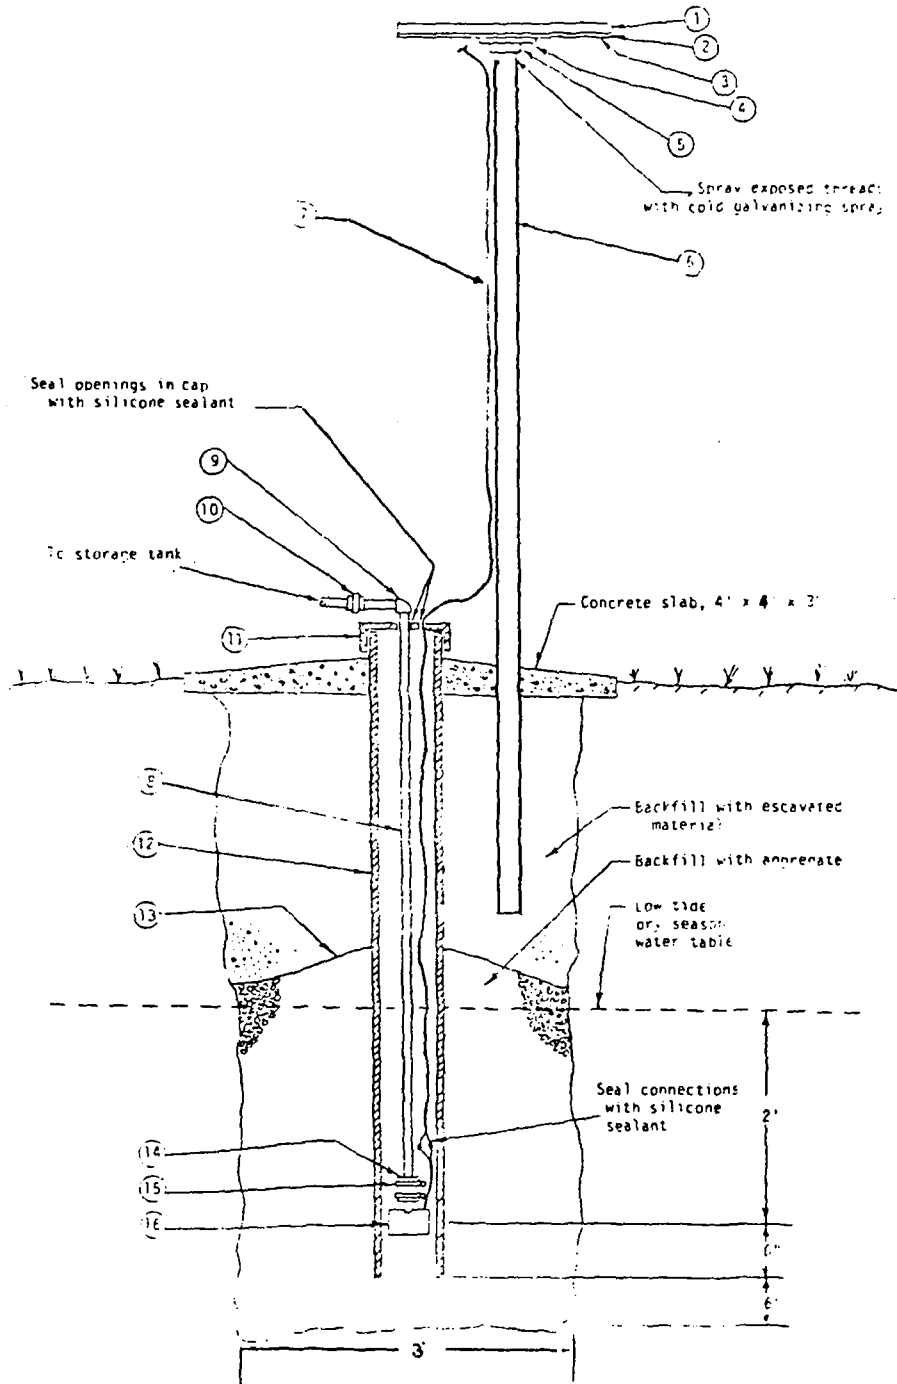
Assembly drawing of the "WERI Well." (not to scale)
